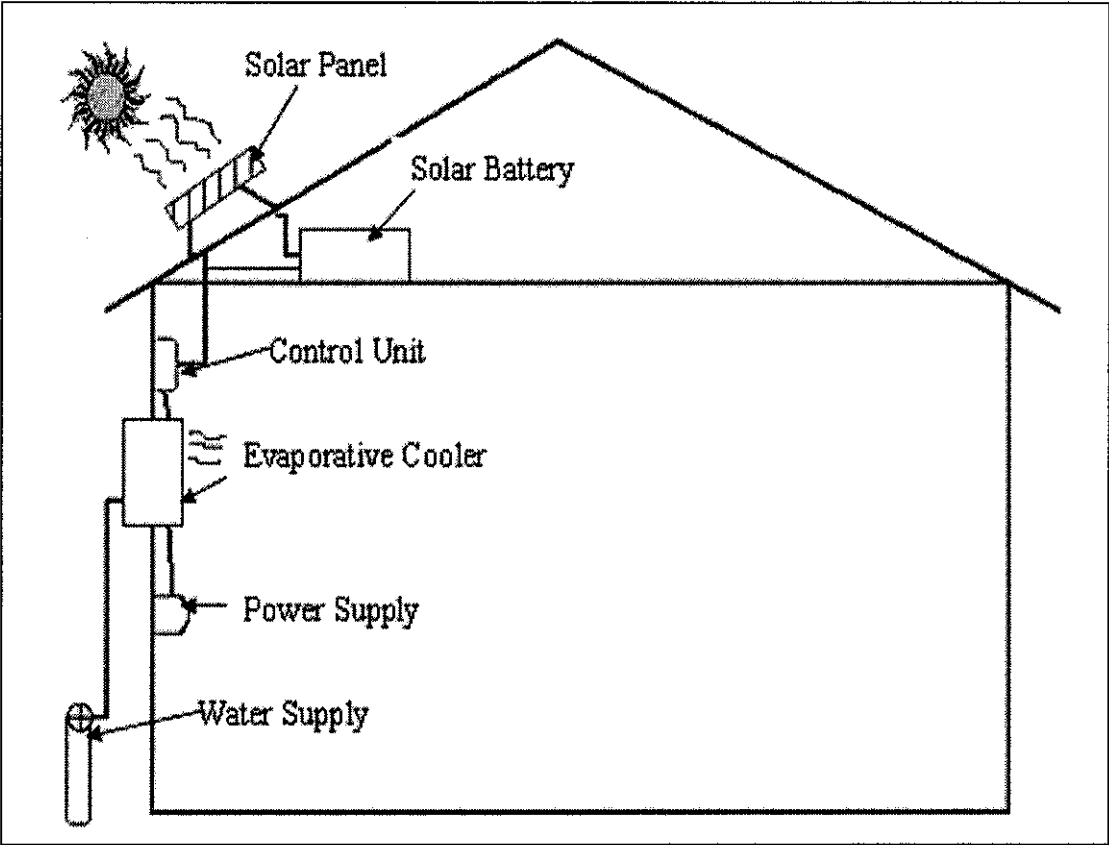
Plan of the evaporative cooling system placing to the house
